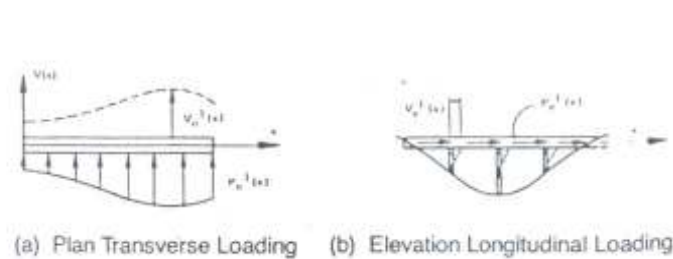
Bridge deck subjected to Equivalent Transverse and Longitudinal Seismic Loading
